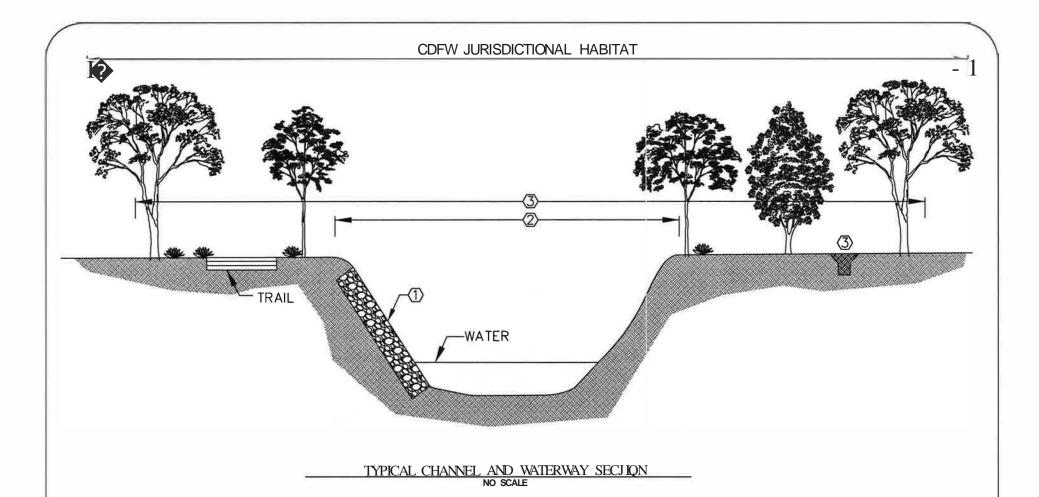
4B Typical Cross Sections Post-Bridge Washing & Painting, Silt, Sand or Sediment Removal
